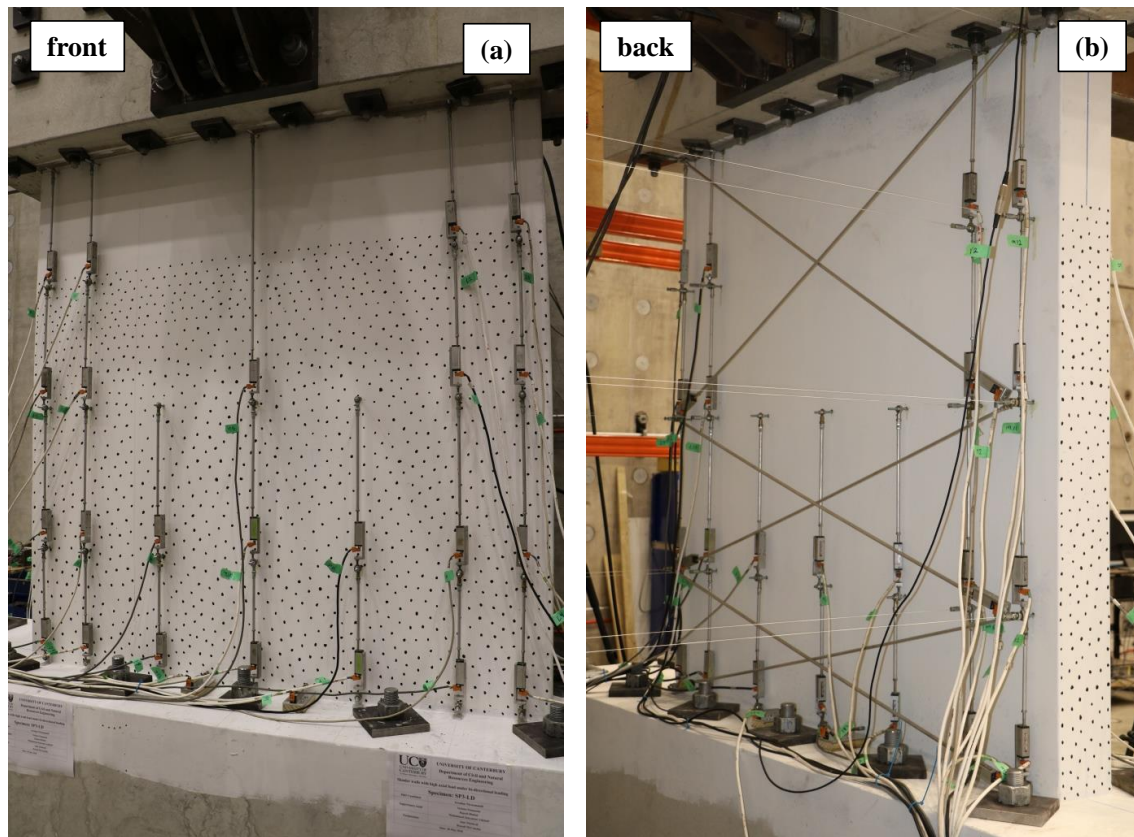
Photo of LVDTs on the (a) front and (b) back faces of the specimen
